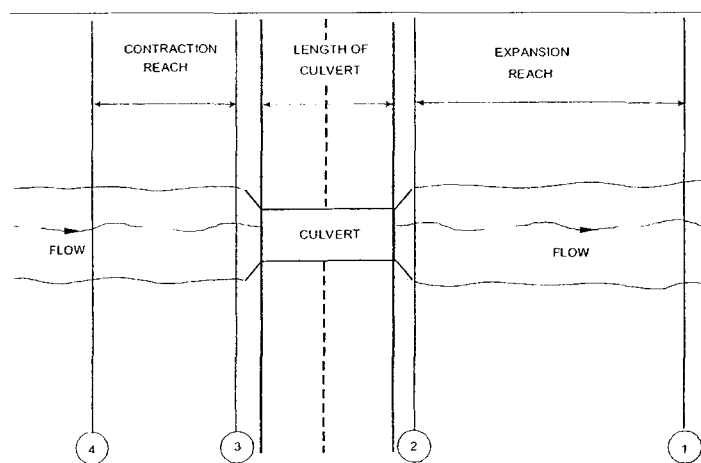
Cross section layout for culvert (Haestad Methods Inc., 2002)
